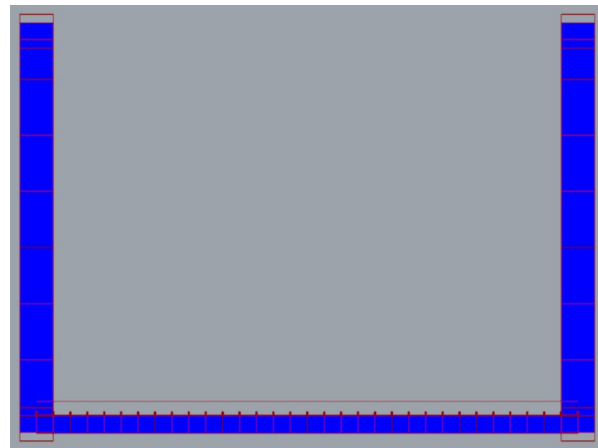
Cross-section of the truss bridge as modelled with Karamba
